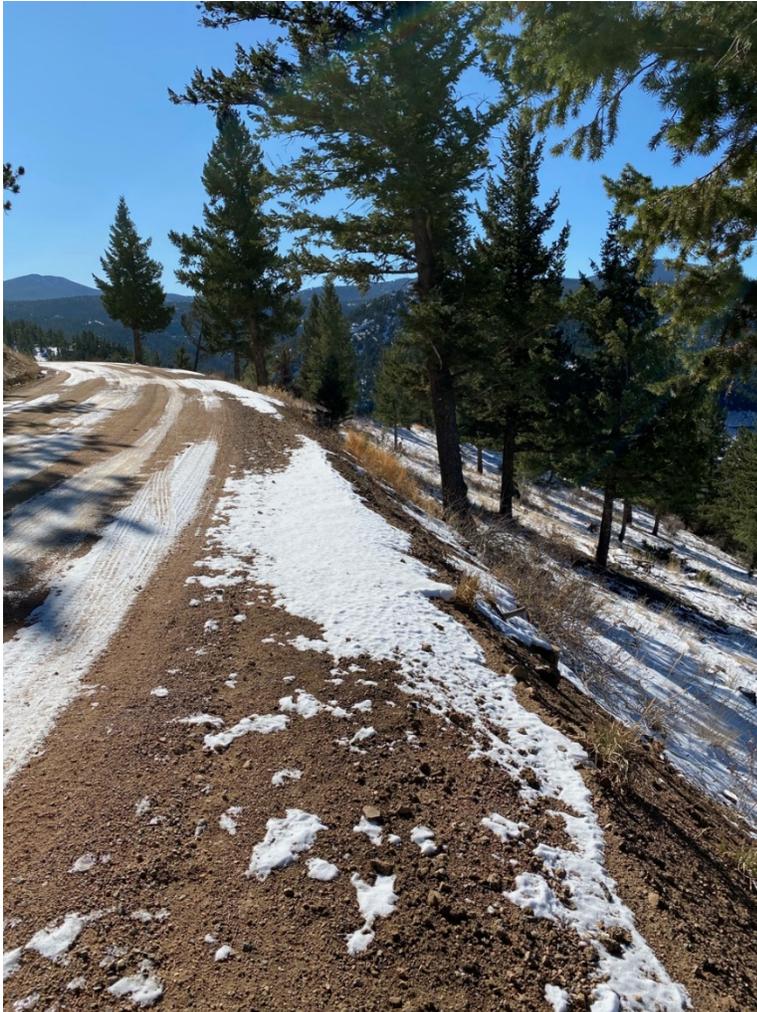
Example of road widening along Gross Dam Road. This type of expansion can be found all along the road.
